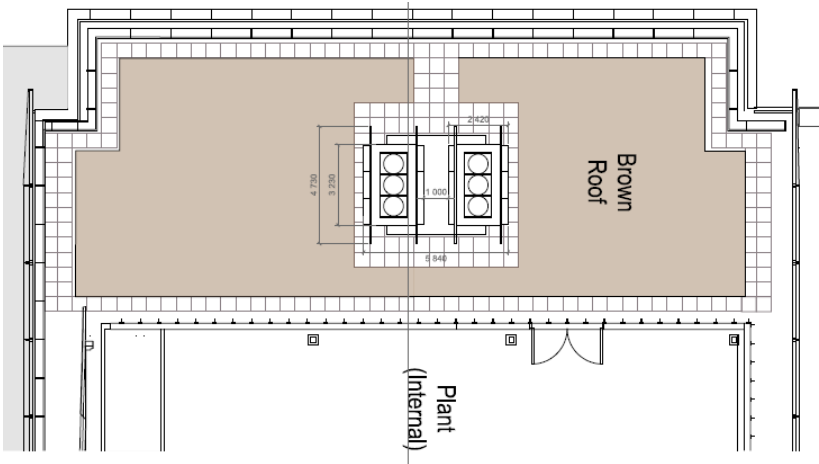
Proposed Level 06 Layout with Chiller Compounds
